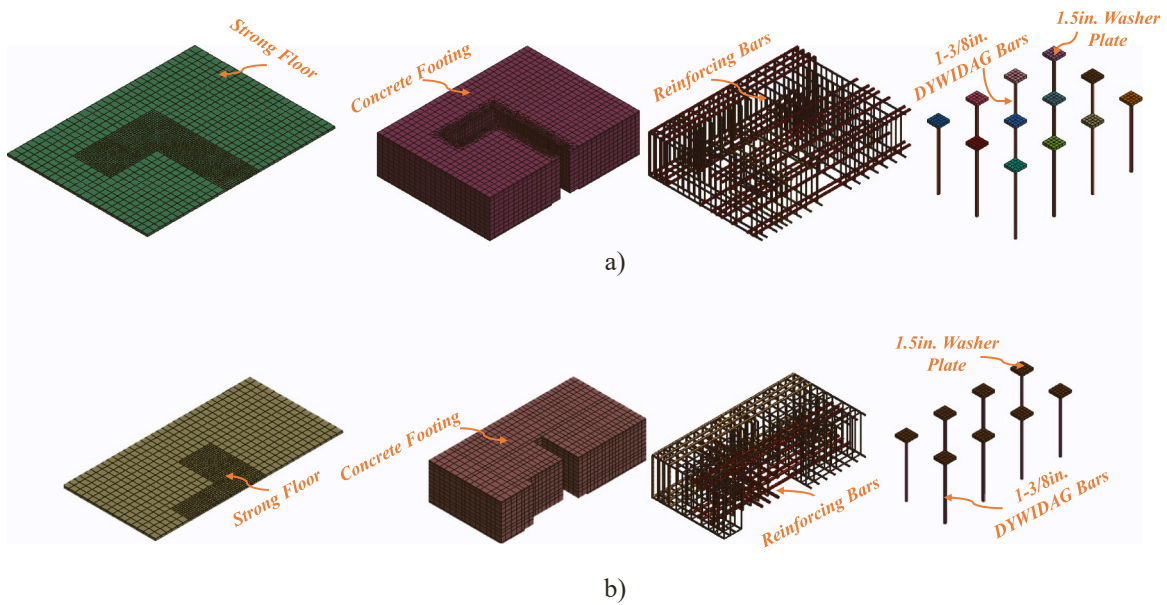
Finite element model of reinforced concrete footing for: a) C- and; b) T-shaped wall specimens (1 in. = 25.4 mm).
